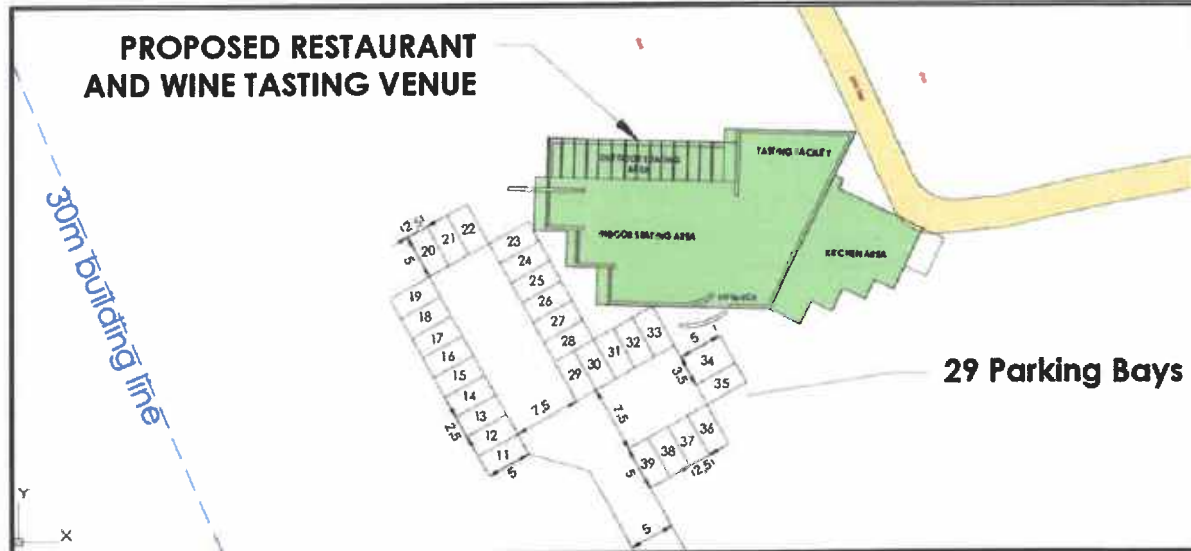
Proposed tourist facility (Tasting facility and Restaurant).
